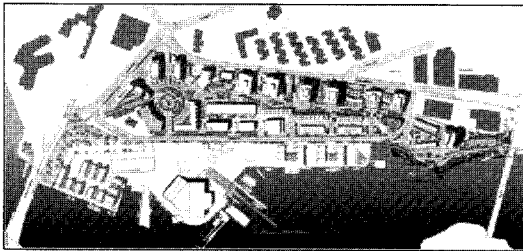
Master plan of Dockside Green Project. 선창가 그린 프로젝트 마스터플랜. (Source: www.docksidegreen.com)
